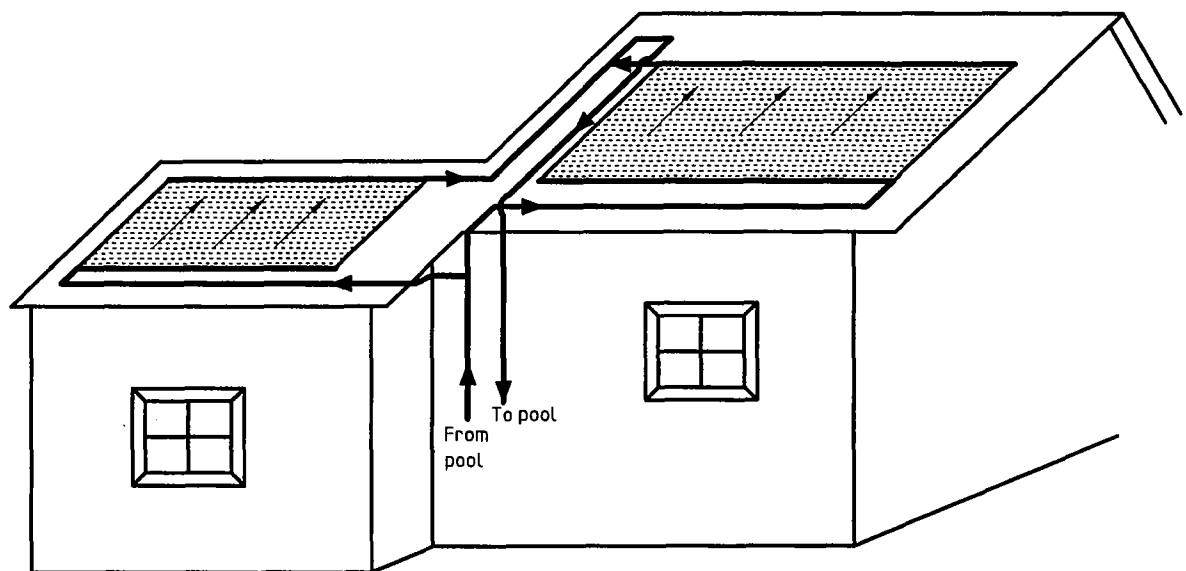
Recommended plumbing arrangements for collector panels at different elevations
